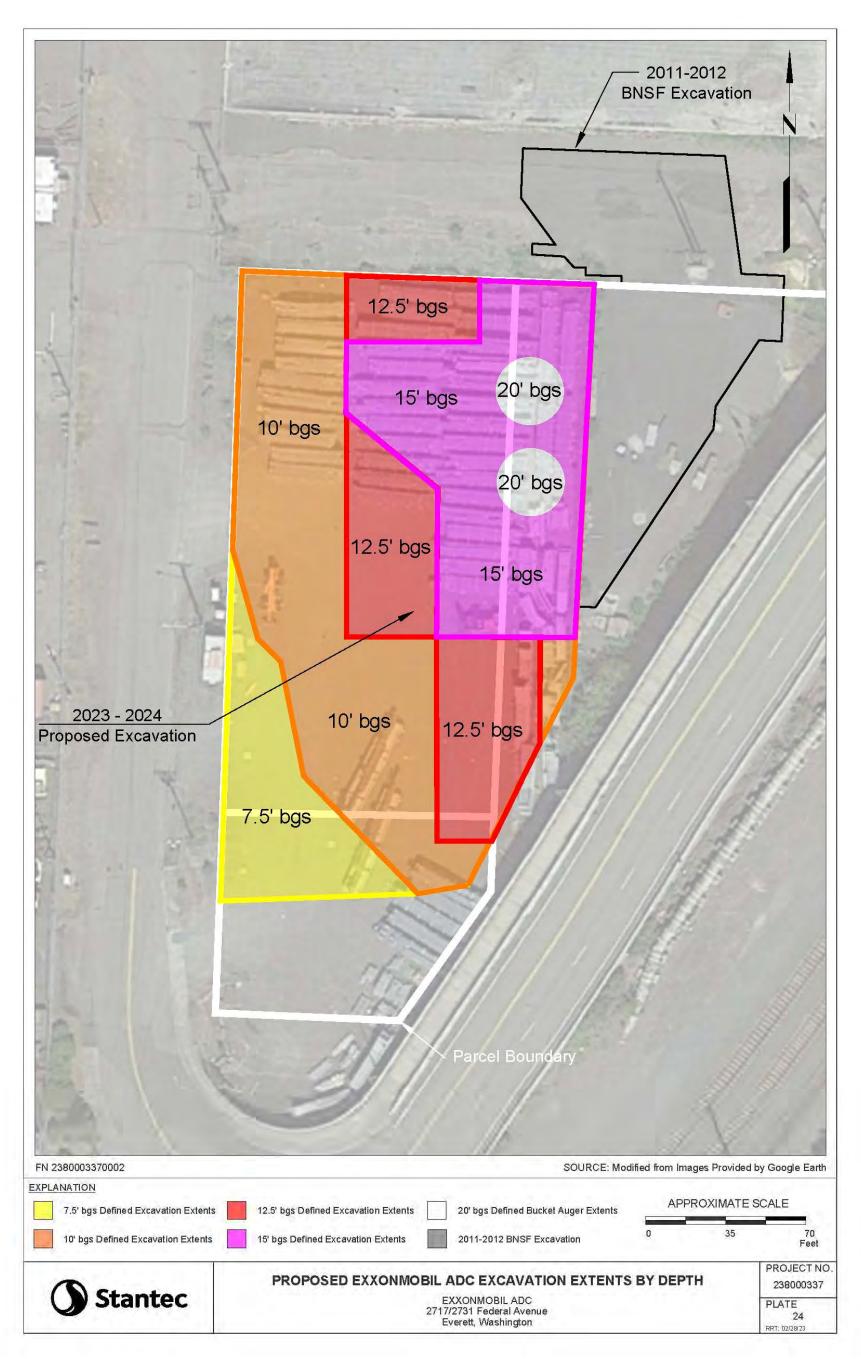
Proposed Excavation Extent on East Side of Federal Avenue
